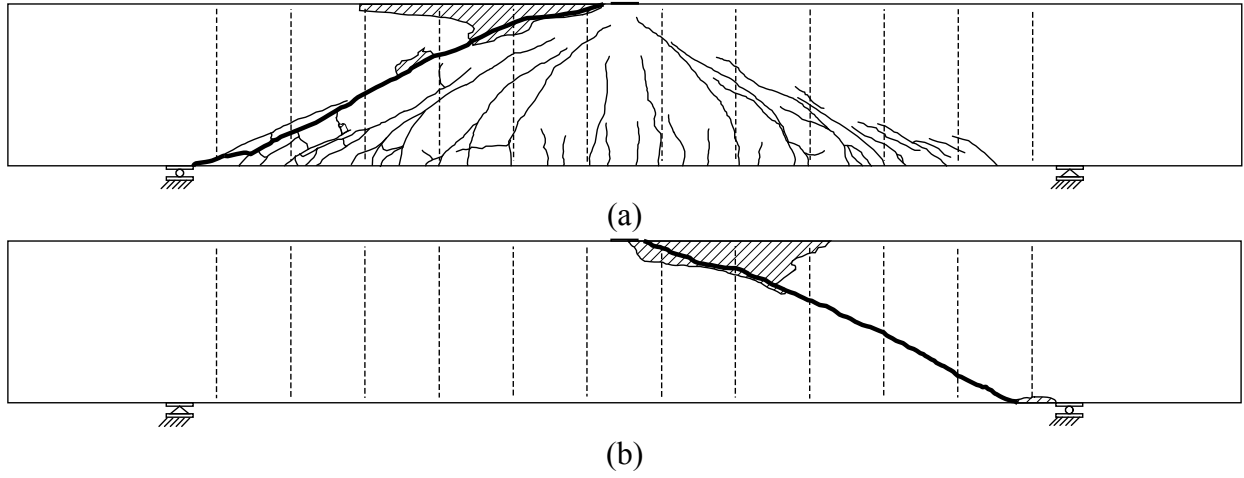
Observed damage in specimen P2S7, (a) front side, (b) back side
